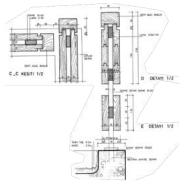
Plan and section of the balustrade in $\frac{1}{2}$ scale.
